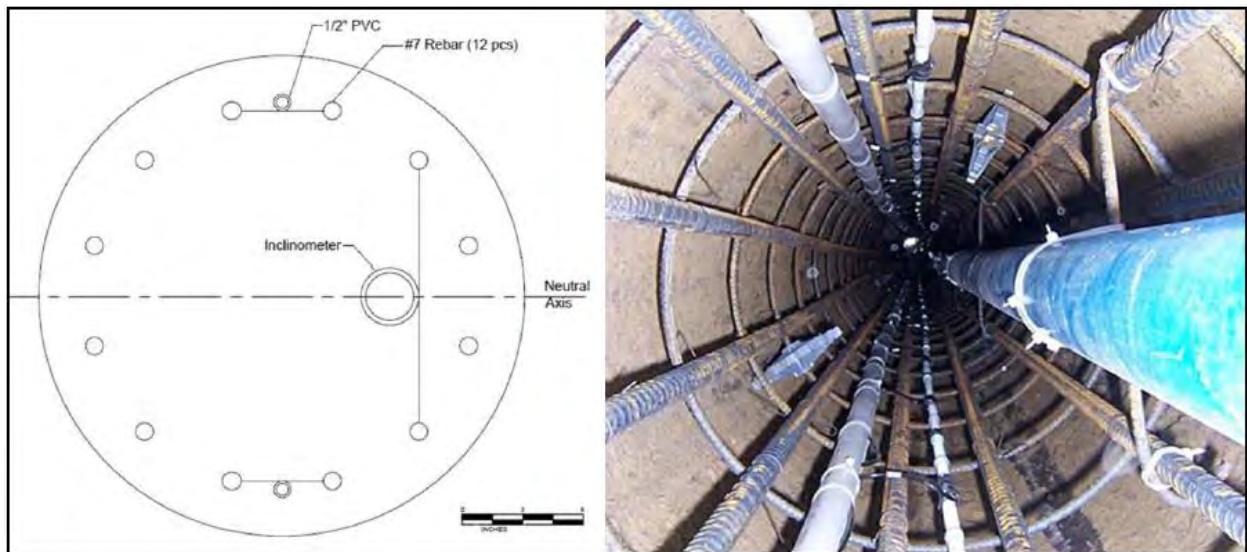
Plan view of instrumented rebar cage before concrete placement.
